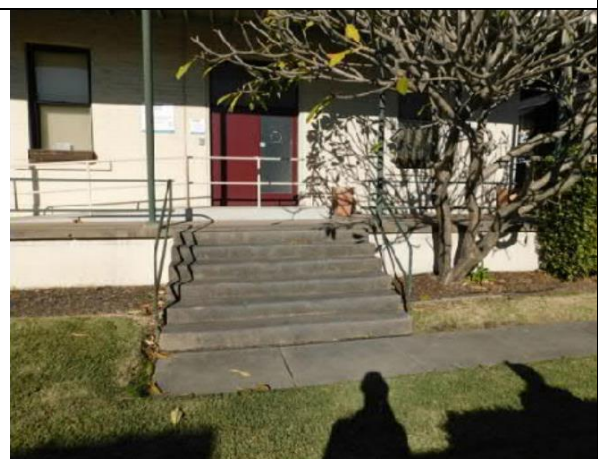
Entry steps and front door. Note the ground floor verandah has been replaced with concrete. Posts and balustrade are galvanised pipe. (Source: EJE Heritage, Heritage Impact Statement, 2023).
